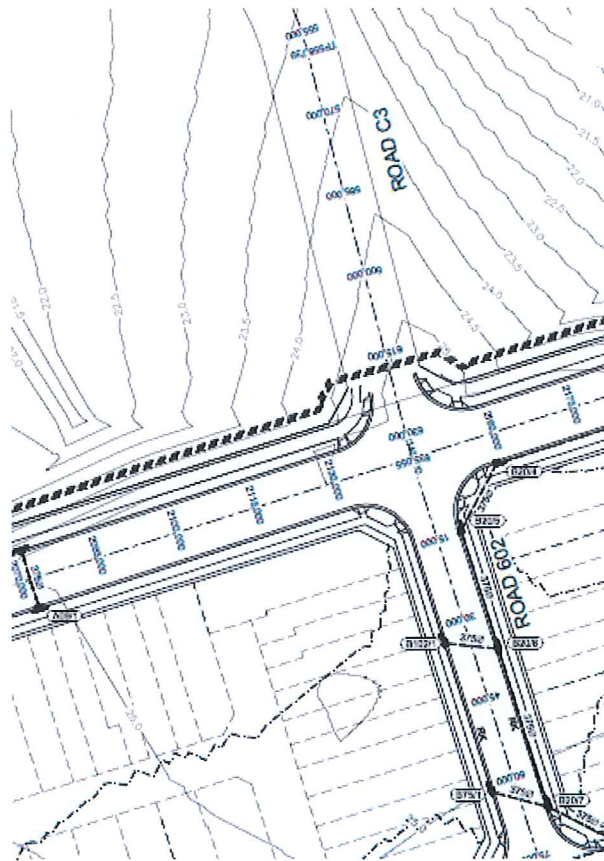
Extract from Plan No 11035003/DA07 showing cross junction intersection at Road 602/Road 100/Road C3
